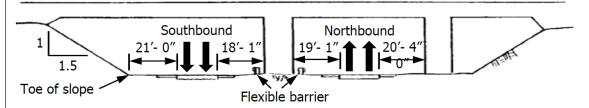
Bridge elevation view of horizontal clearances for separate southbound and northbound highway features below the bridge, with flexible barriers.
